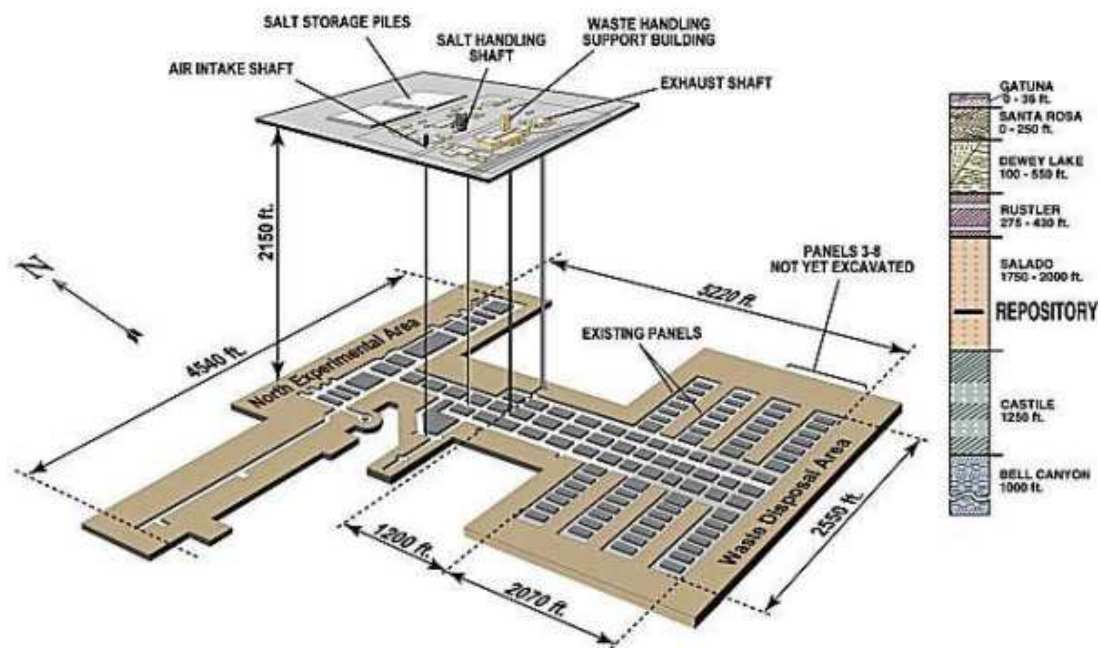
Layout of the Waste Isolation Pilot Plant<sup>17</sup>.
